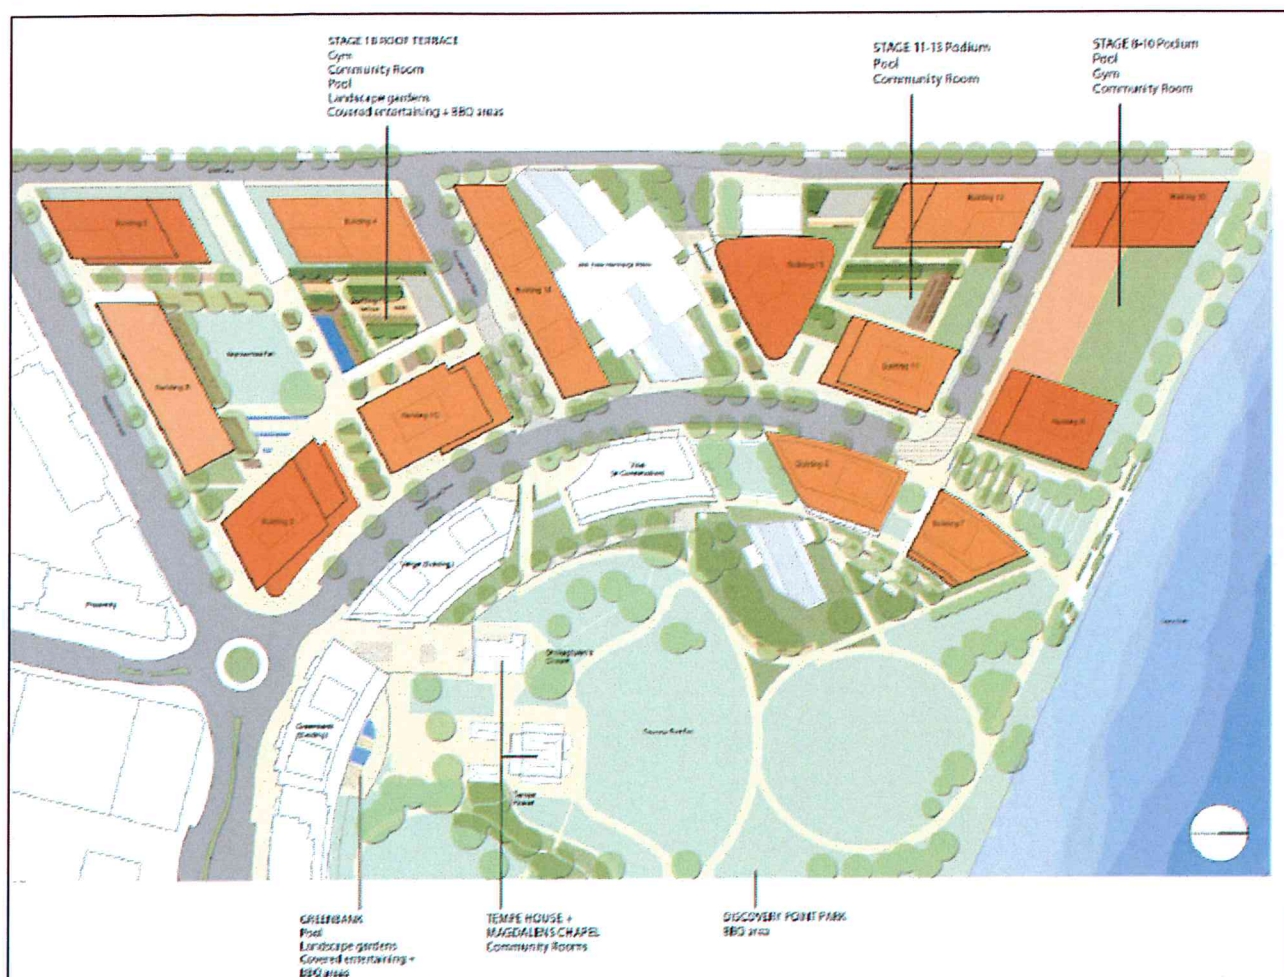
Plan showing open spaces, communal facilities and community facilities provided via Concept Approval.
